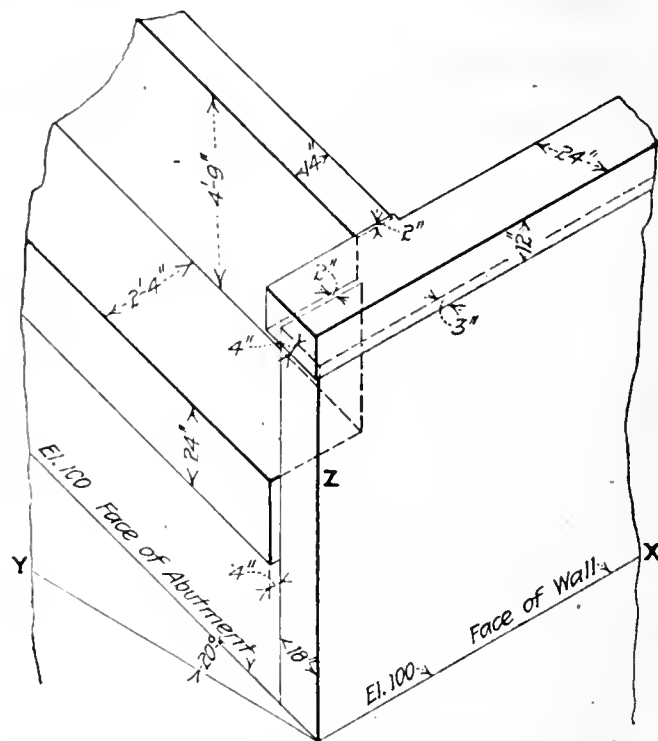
INTERSECTION OF RETAINING WALL AND ABUTMENT
